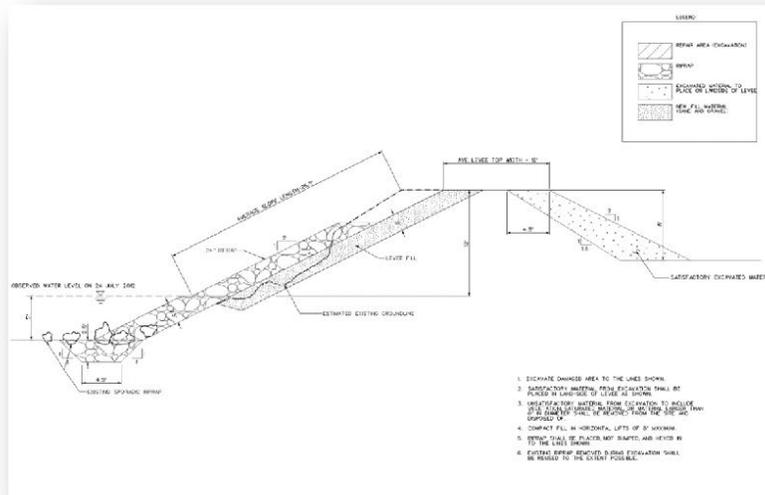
Cross section of damaged Emmett levee showing planned repairs.
